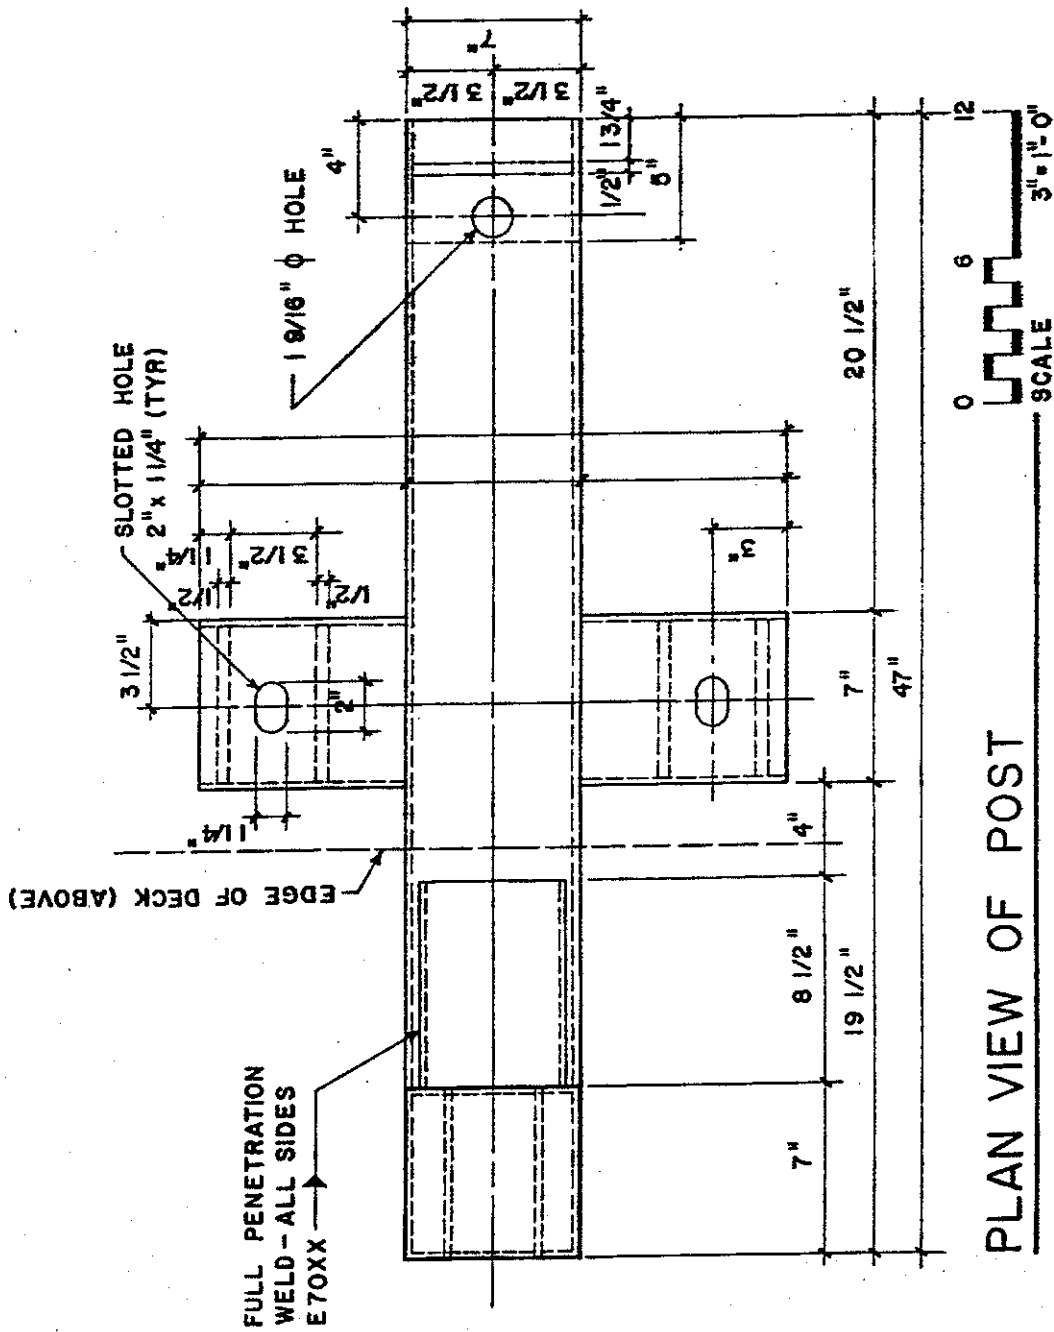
Fabrication Drawings of Energy-Absorbing Bridge Rail (continued)
